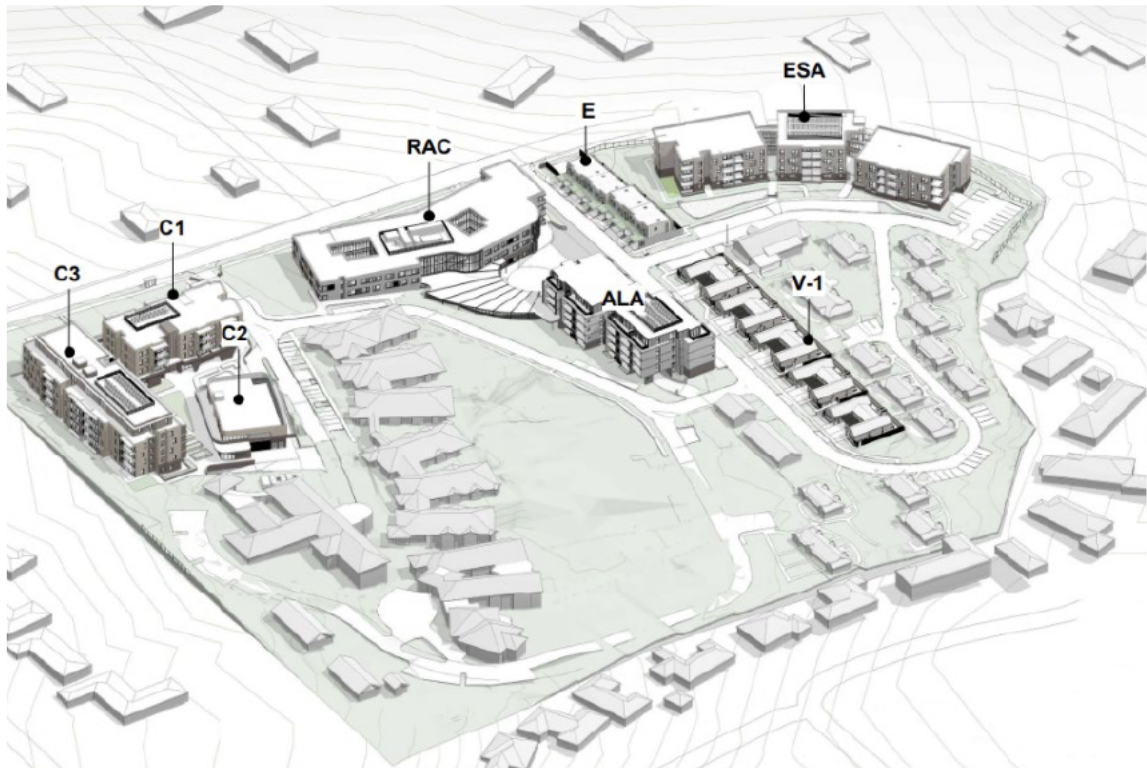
Stage 2 3D diagram overview (Source: Masterplan, prepared by Thomson Adsett)
